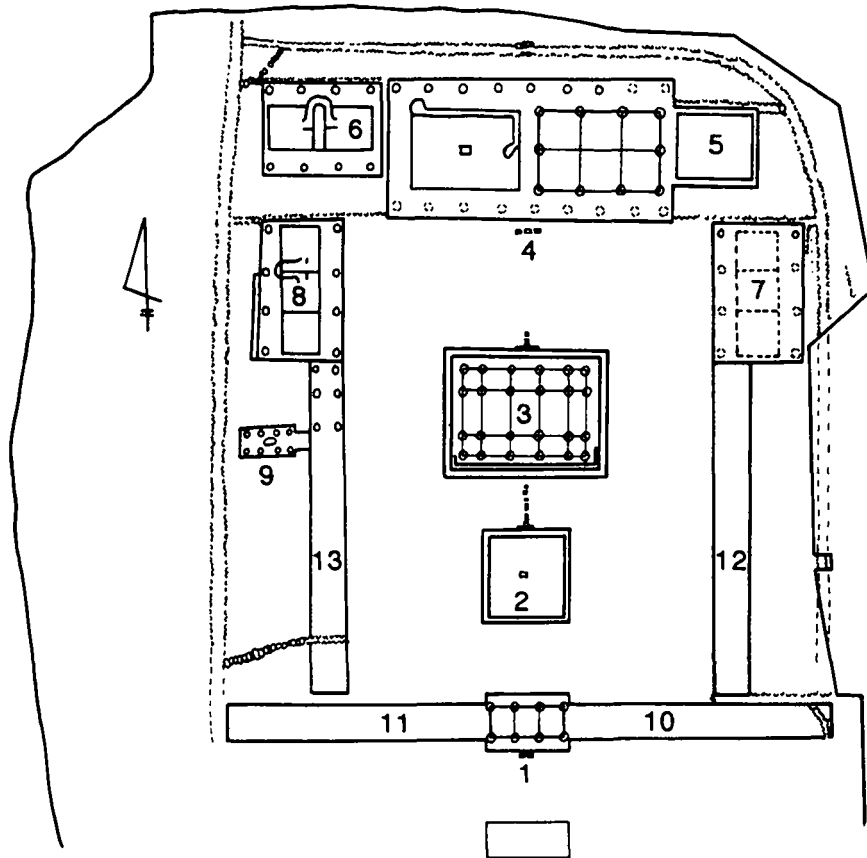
Layout plan of Nŭng-sa 陵寺 능사 with indication of the excavated structures (see table 12) (566 AD, scale: 1 : 1,000)
